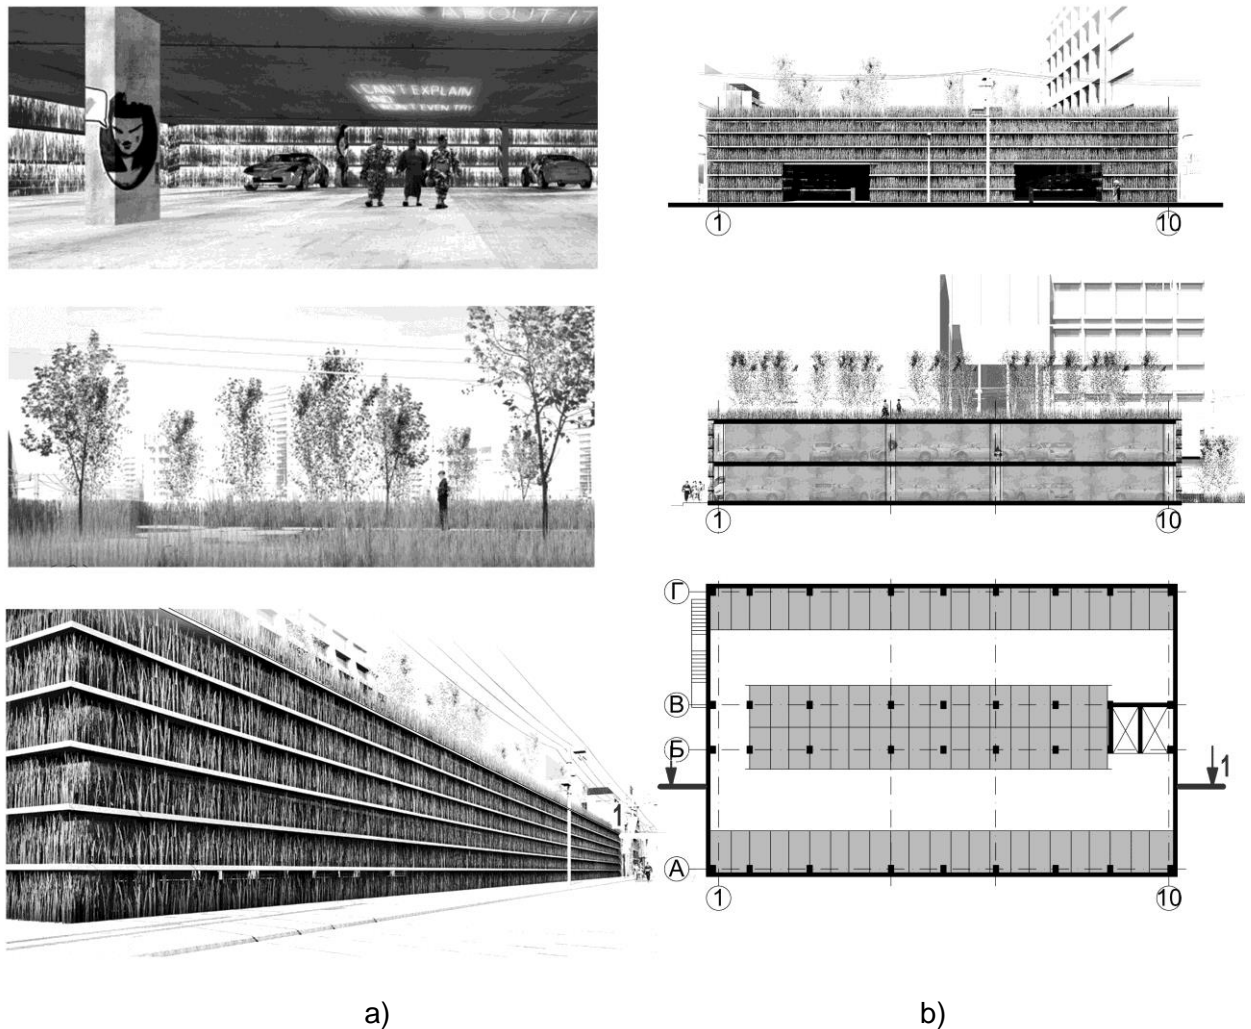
(a,b). «Shinjuku Gardens», open multi-storey parking garage, Christoph Vogl, Tokyo, 2010: a) interior, green roofs, general view; b) façade 1 – 10, section 1-1, typical floor plan
